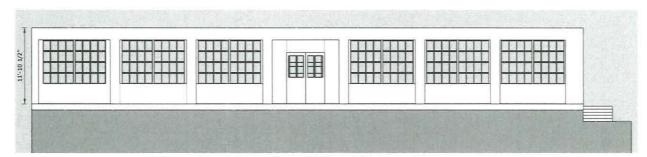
Wilcox Front Elevation - View from Wilcox Rd.
